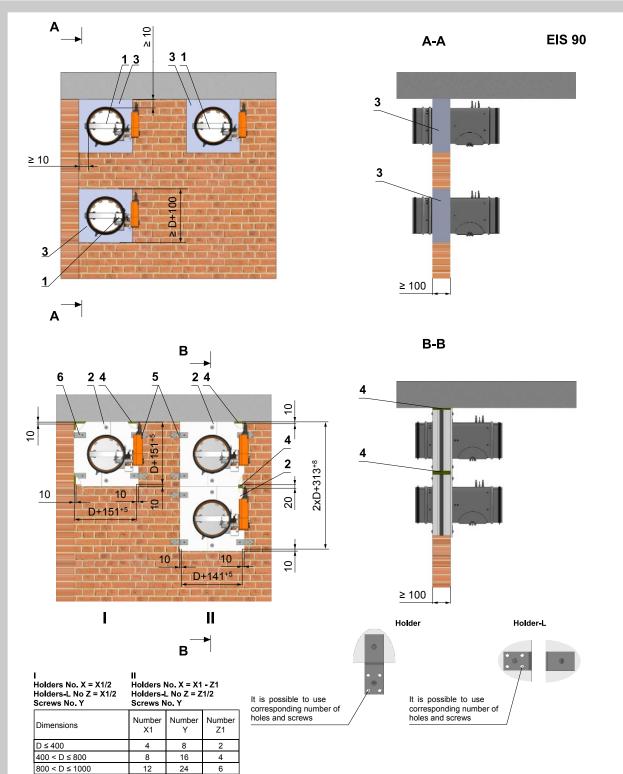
Solid wall construction - installation next to wall, ceiling - mortar or gypsum and mineral wool
